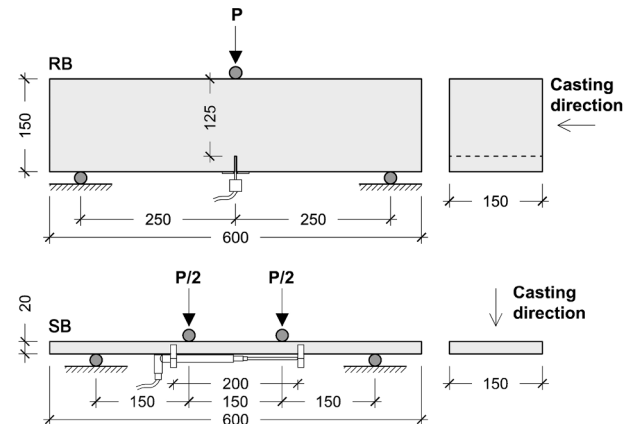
Rilem beam (RB) specimen (top) and *structural* beam (SB) specimen (bottom) test configurations (measures expressed in mm).
